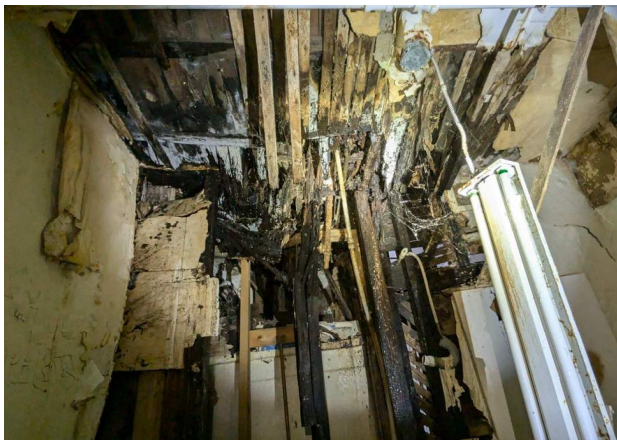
, Structural collapse of floor and failed supporting wall due to rot at 4th floor.
